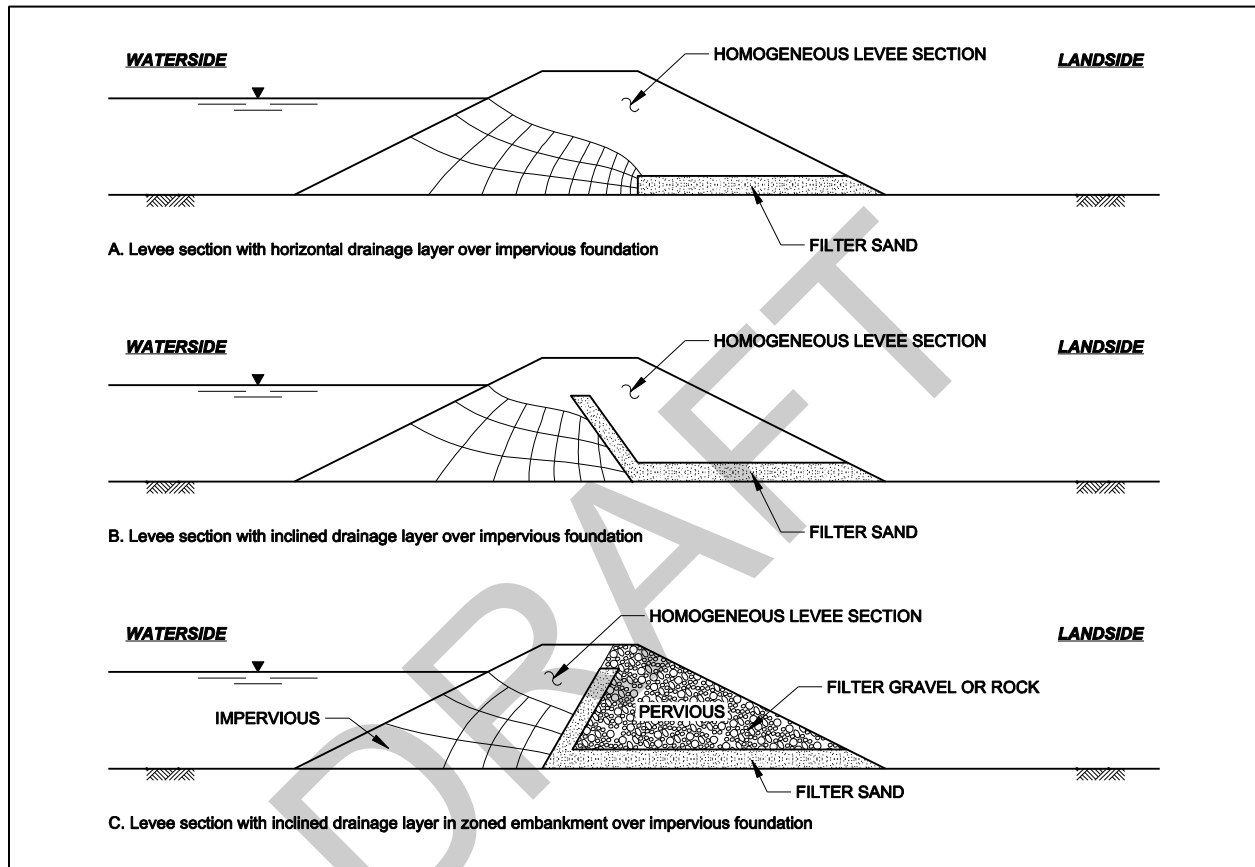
Use of Horizontal and Inclined Drainage Layers to Control Seepage Through an Embankment.
